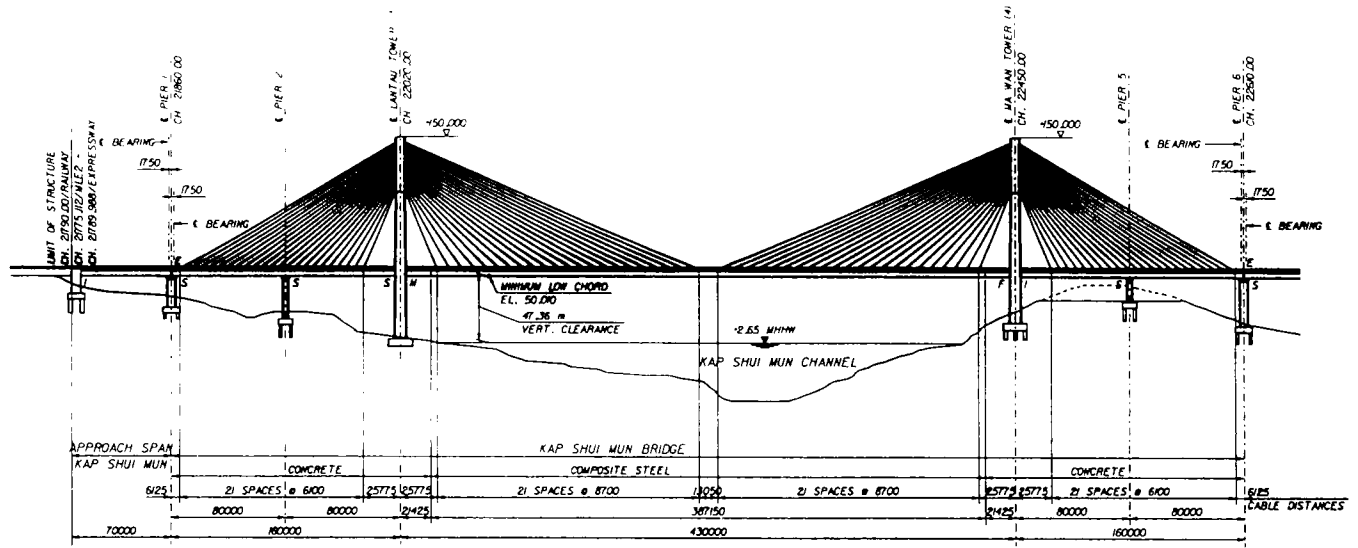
Elevation: Kap Shui Mun Bridge.
